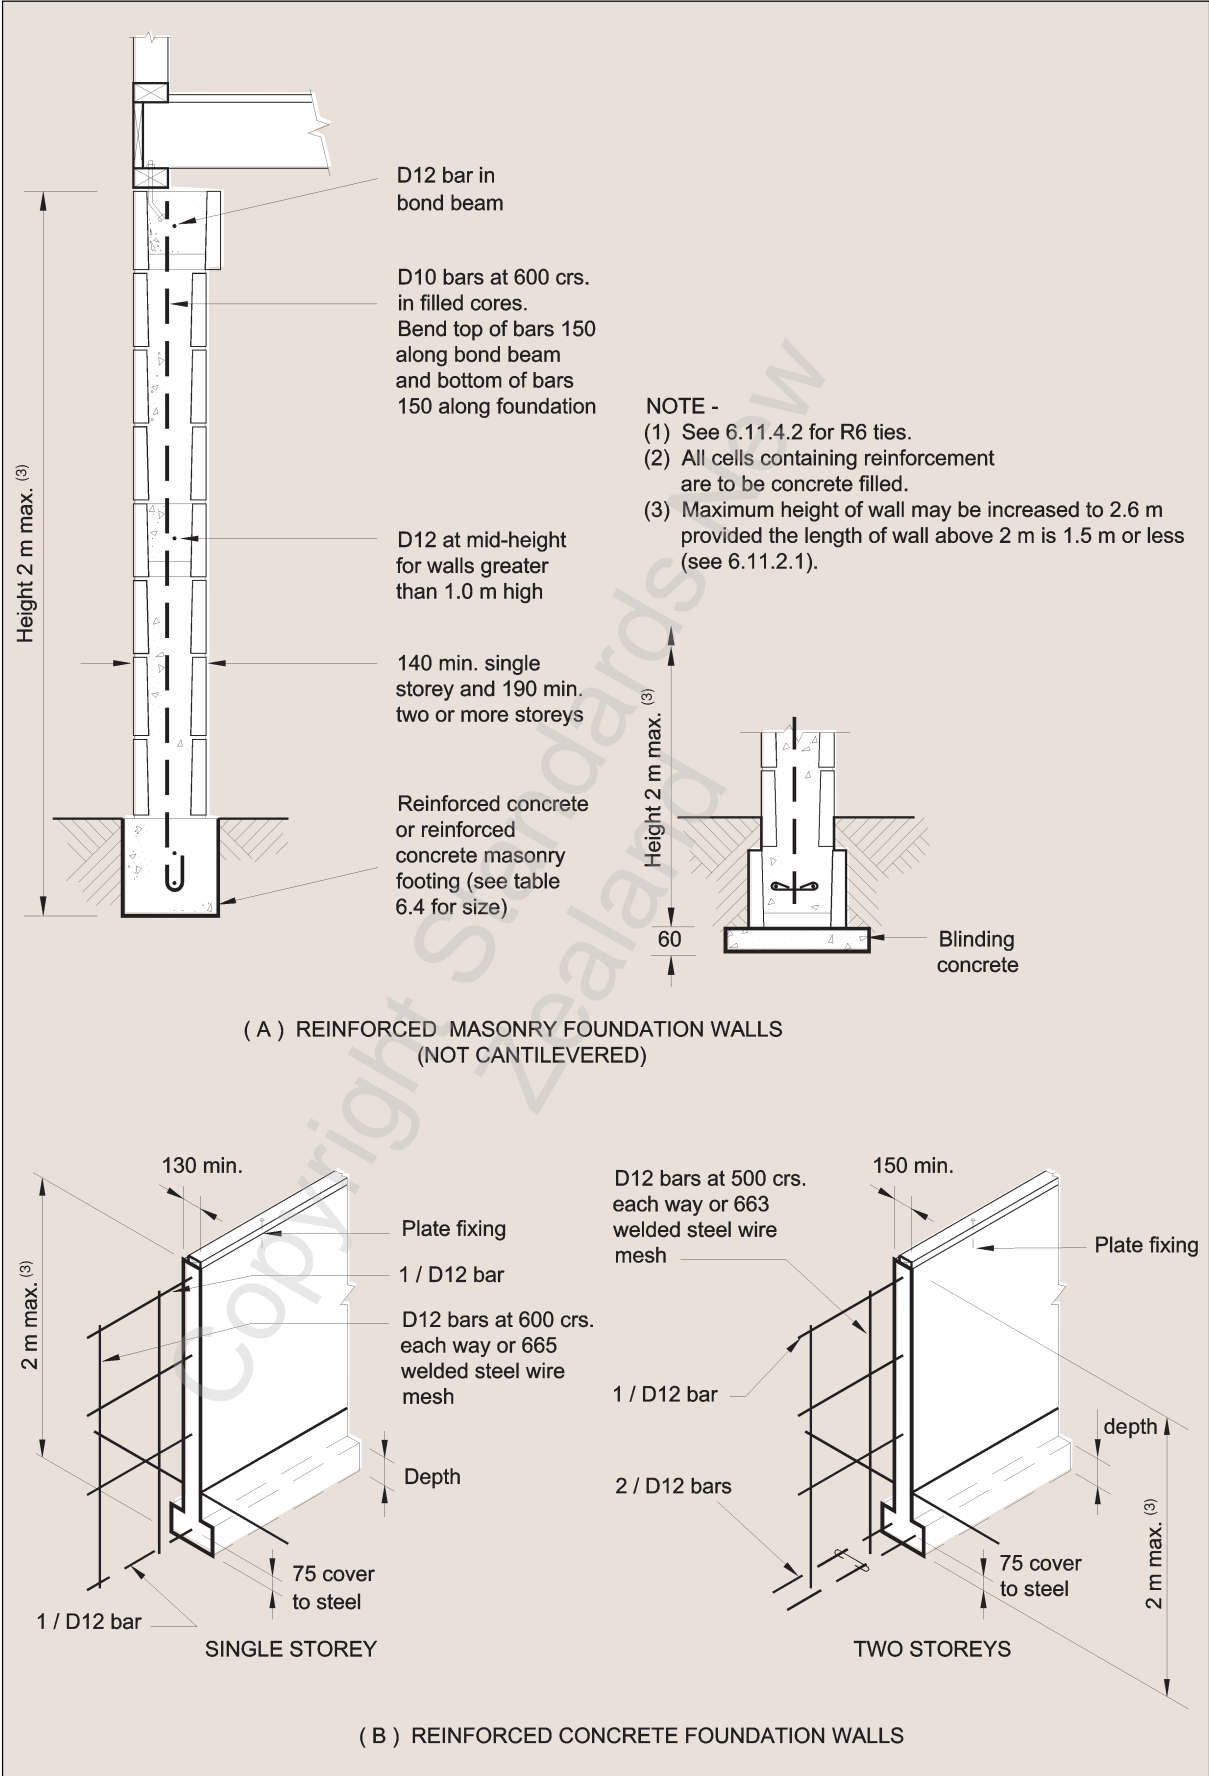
Reinforced masonry and reinforced concrete masonry foundation walls (not cantilevered) (see 6.11.7.1)
